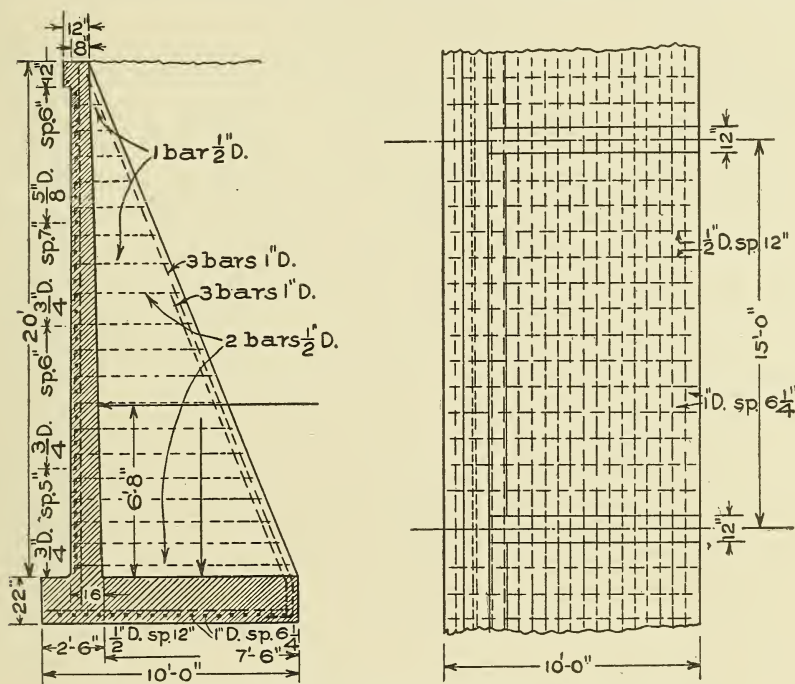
Section and Plan of Retaining Wall, Showing Reinforcement.
